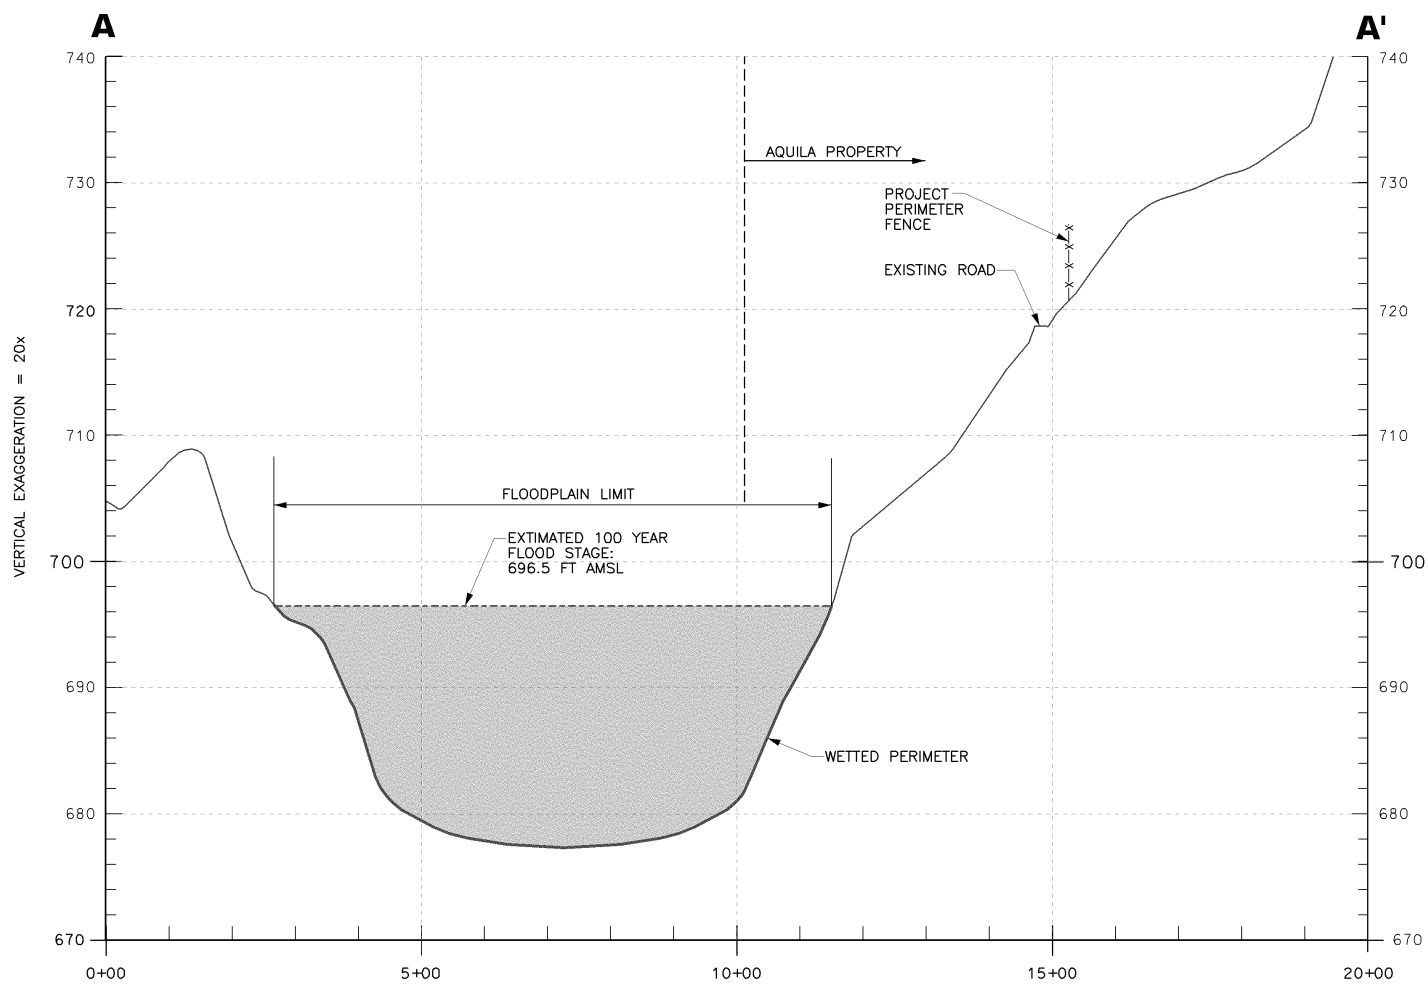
through 6 show the extent of the 100-year floodplain relative to proposed Project improvements in cross-sectional view. As illustrated in the plan-view of the floodplain limit on Figure 1, the cross-section views indicate that all proposed Project improvements are located outside the floodplain limit and above the projected 100-year flood stage elevation.
